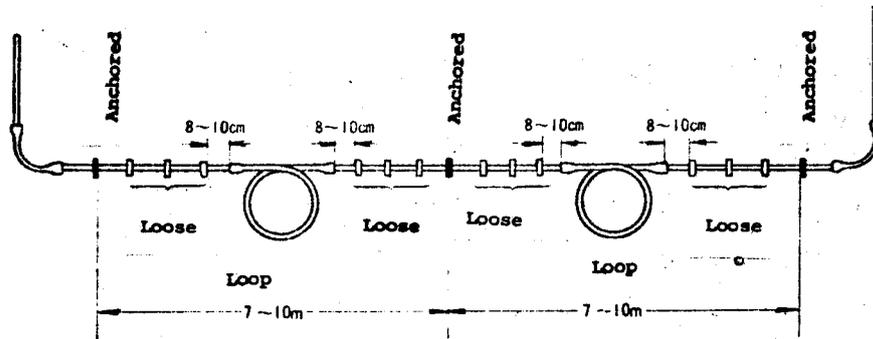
Adjustment of expansion & contraction at bending sections (superbend 13 \emptyset - 25 \emptyset)
